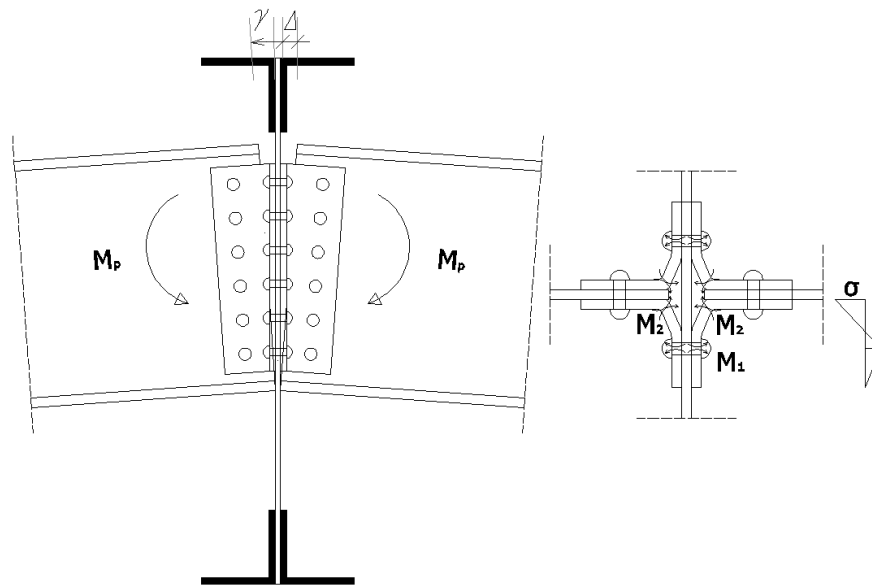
Distortion of outstanding legs of connection angles due to applied load, bridge #2
